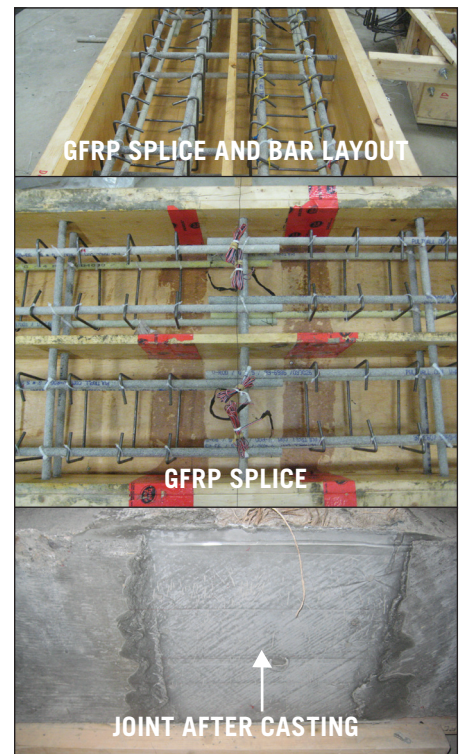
Full cast slab-beam reinforcement details showing spliced region.
